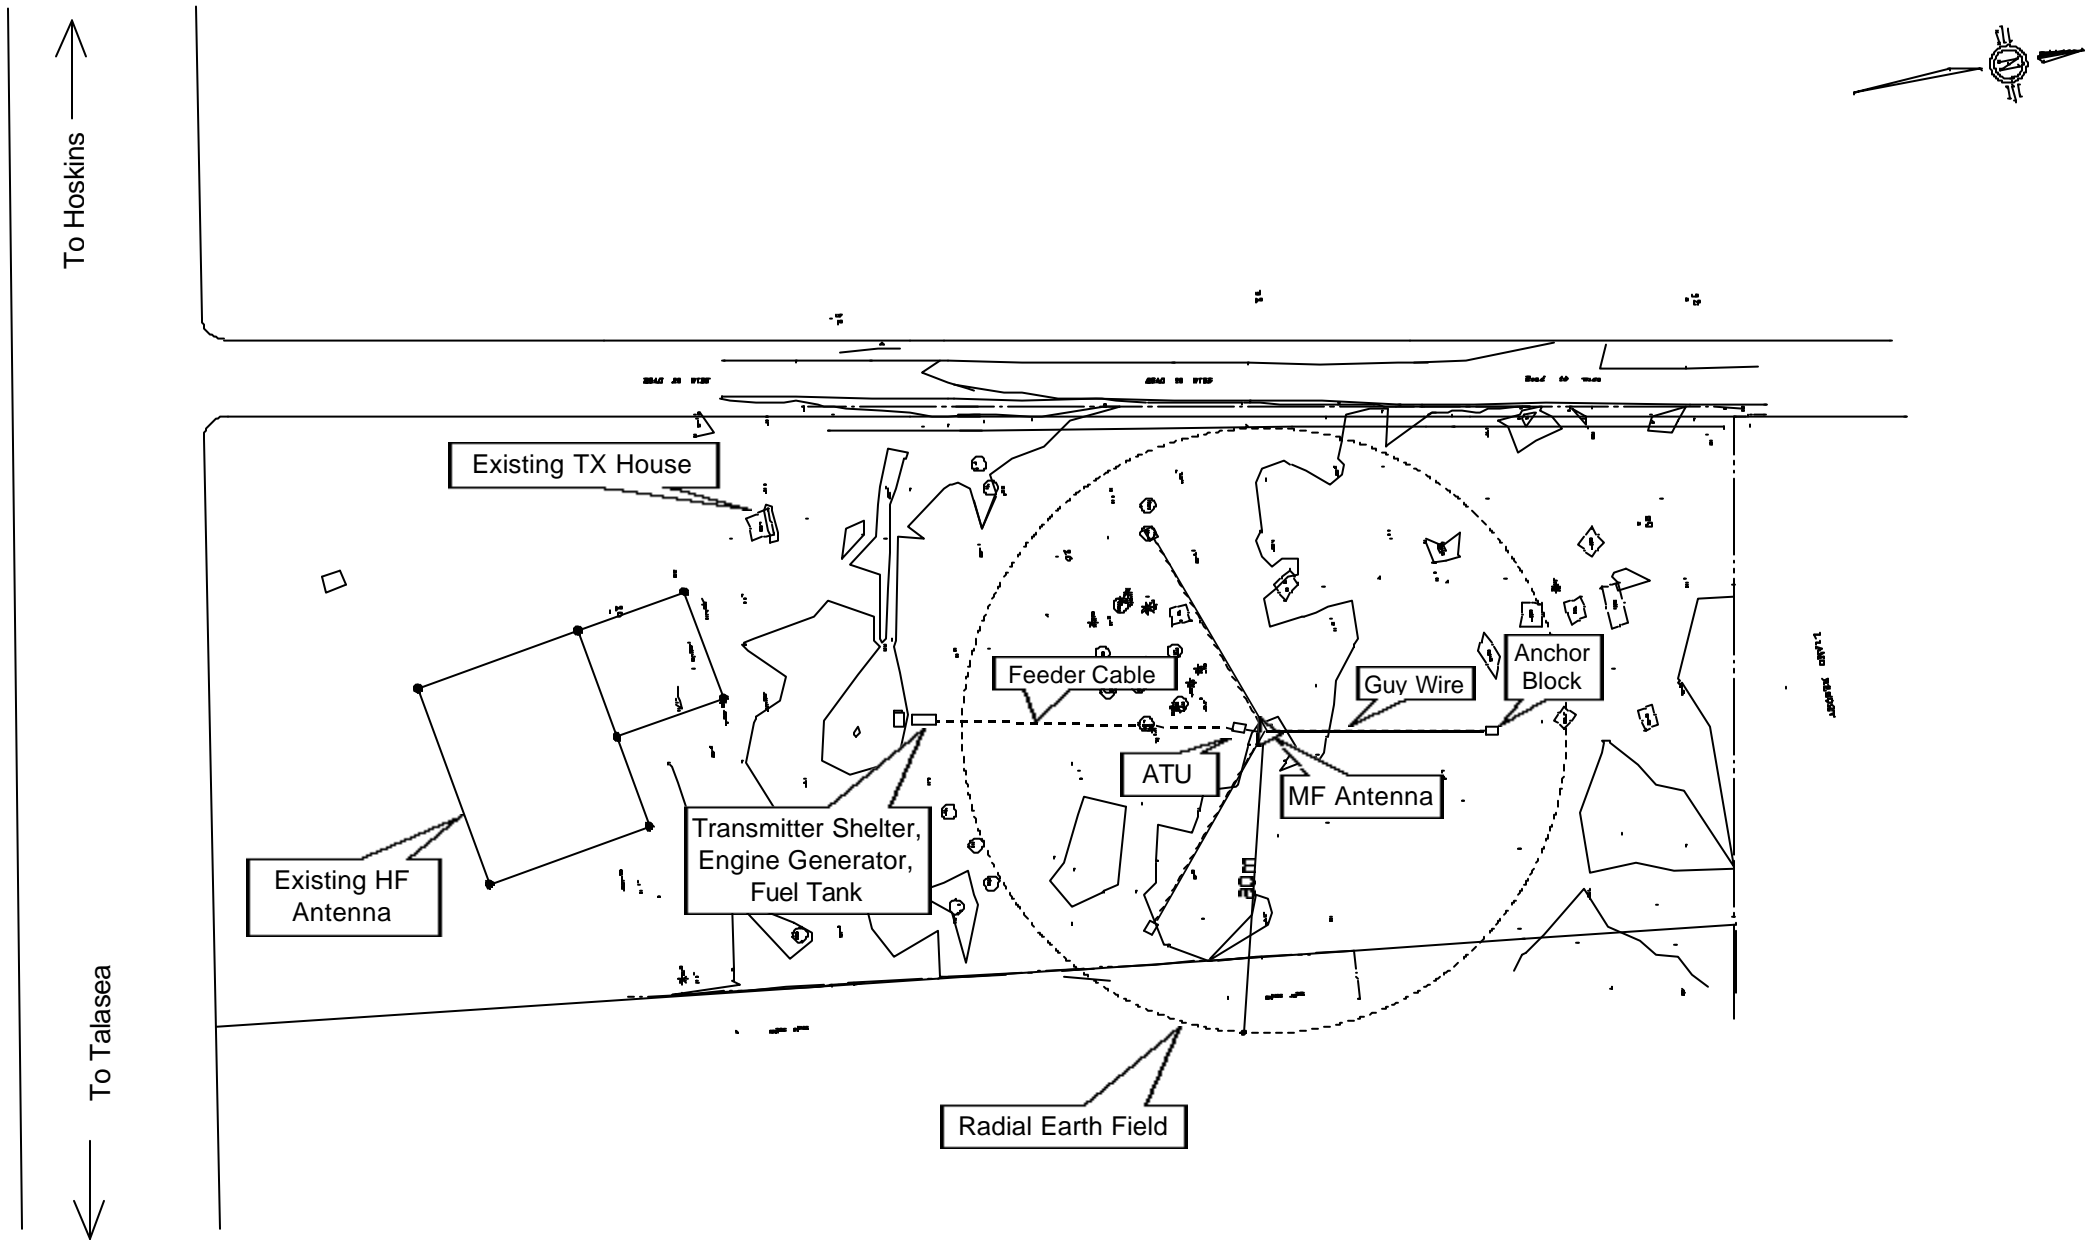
Kimbe MF Radio Station	Site Layout of MF Transmitting Station	S=1:2,000
